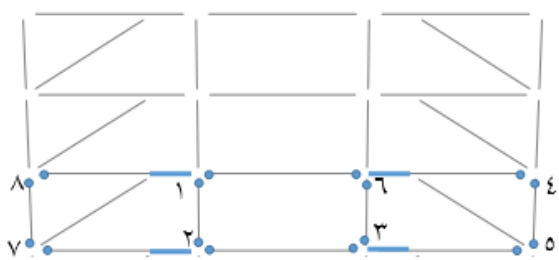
Plastic joints in 18th floor of 20 storey frame
